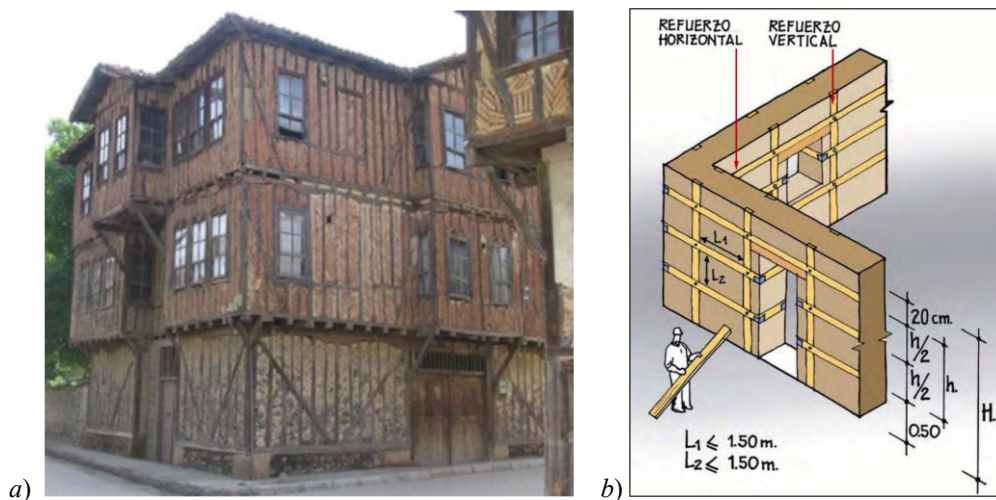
a) Himiş building in Anatolia with mud-brick and timber frames [18]; b) timber reinforcement of adobe or pisé constructions proposed by AIS Colombia [19].
